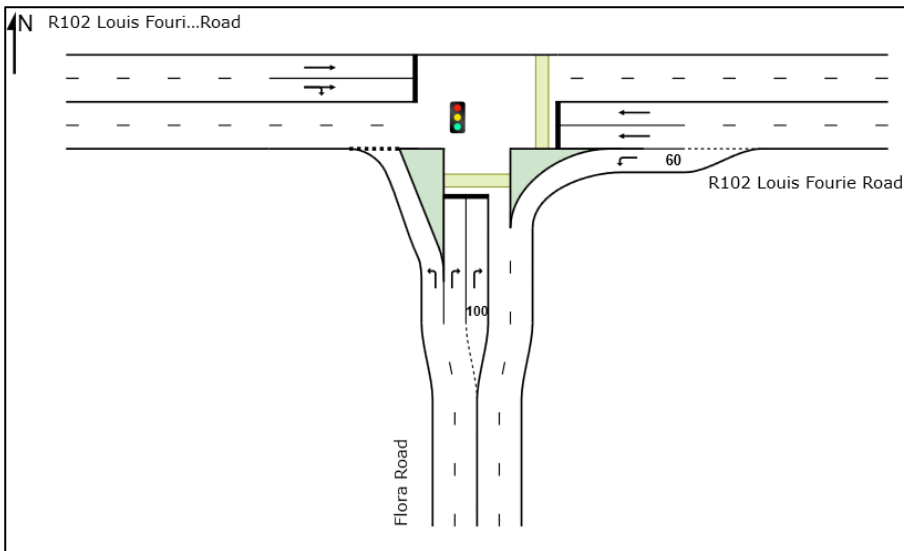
Proposed Intersection Layout: Louis Fourie Road and Flora Road
